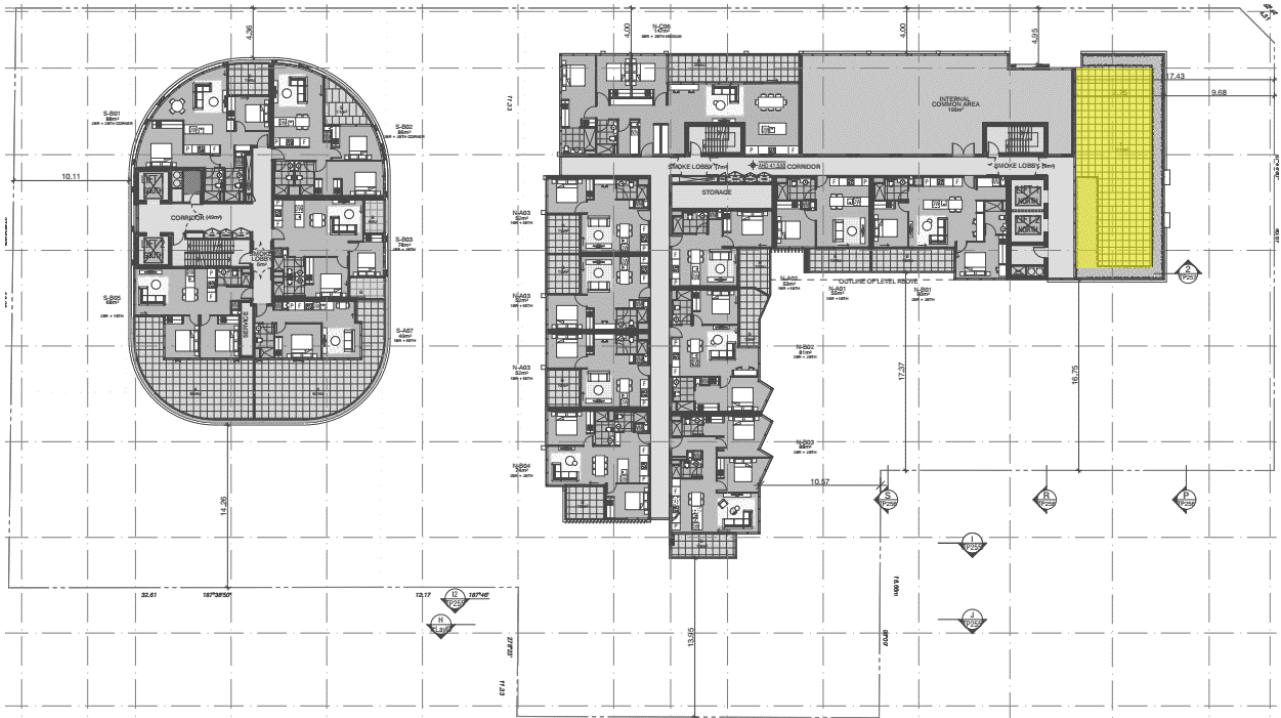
Level 01 plan of the proposed development with the recommended comfort criterion overlaid.
